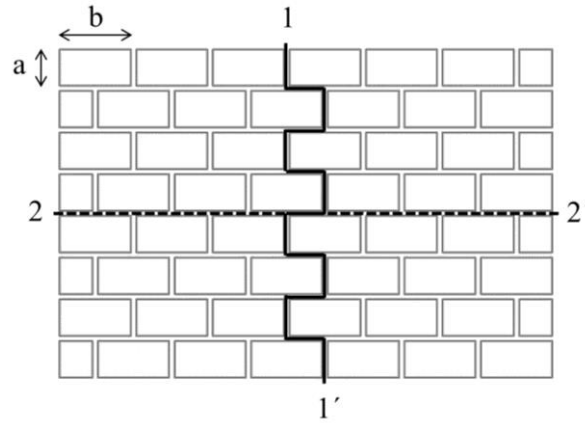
Head (1-1') and bed (2-2') joints direction of a masonry wall
